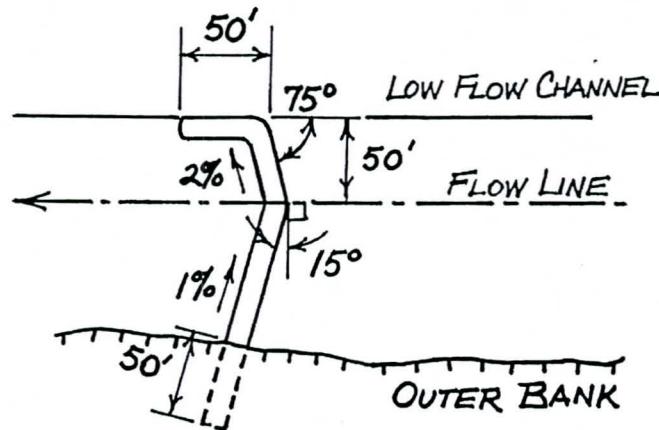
Typical plan view of originally proposed guide dike installation.
